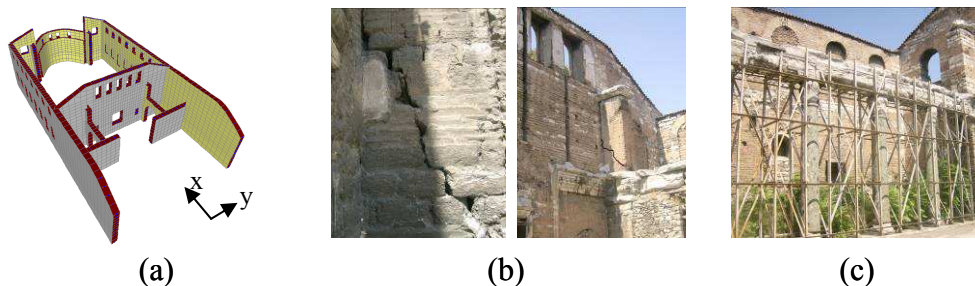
The monastery in 3D (a); Cracks-main wall and supporting column (b); the collonade and the architraves (c)
